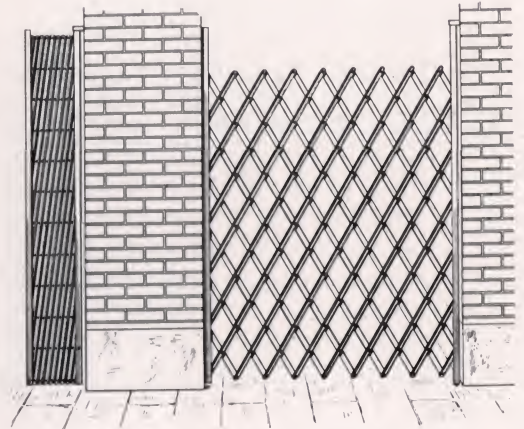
Folding Gates for Factories, Public Buildings, Railroad Stations, Etc.
